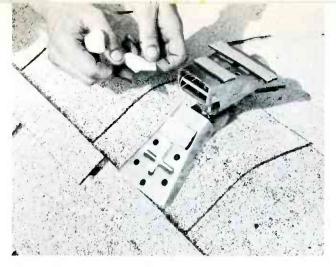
On the bottom of the saddle mount, cover the screw holes with self-sticking tape, which prevents water from entering.
